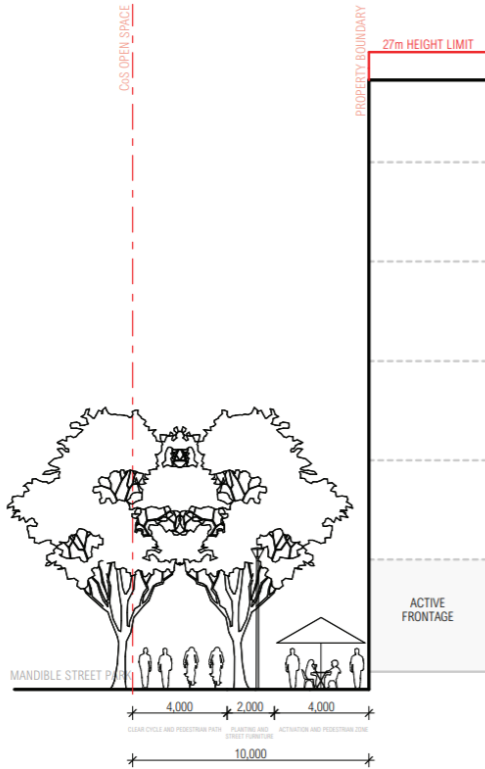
Indicative street section – Hiles Street, North Alexandria
